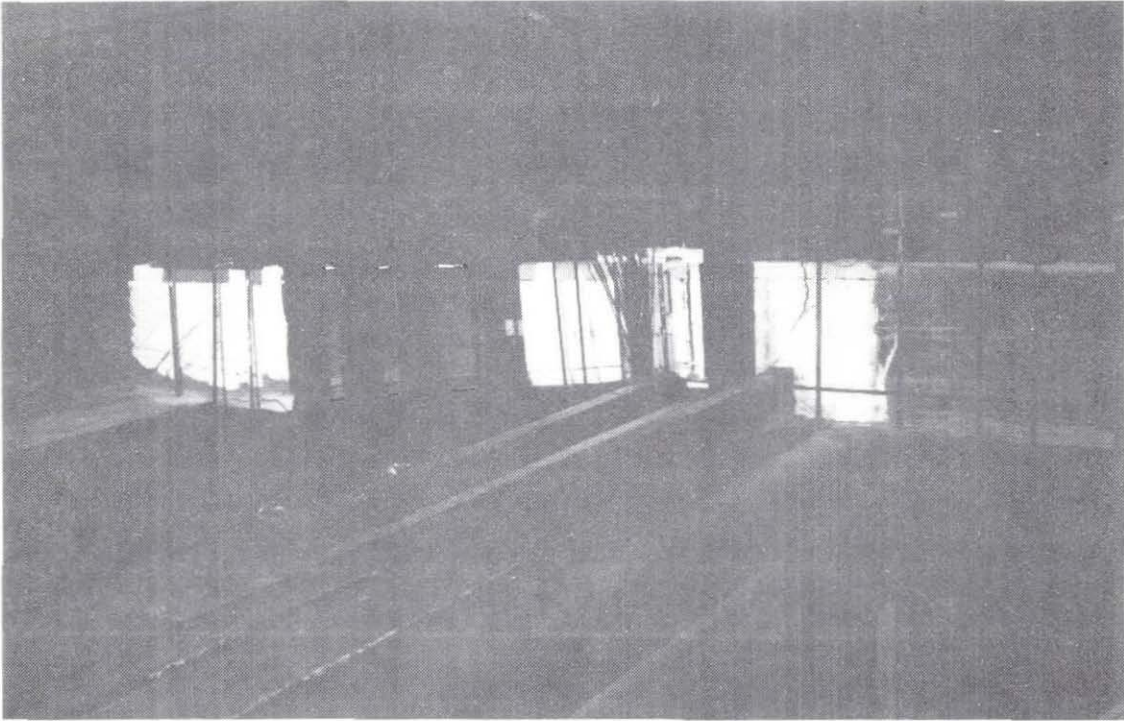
Bent 46, west column deflected shape under 4000 kip load.
